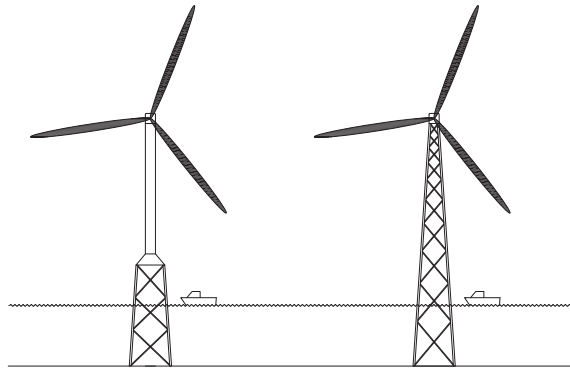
Concepts of jacket and full-height lattice tower. Details such as secondary structures or foundation piles are not shown.
